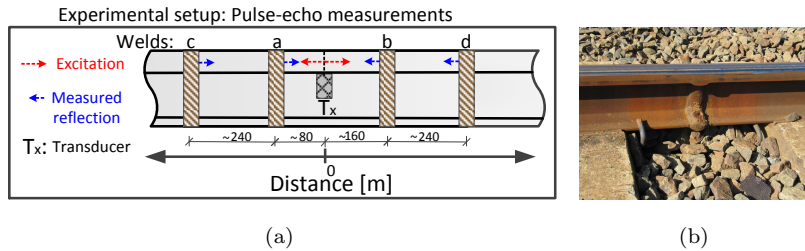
(a) Illustration of the experimental setup with estimated weld distances from the transducer location. (b) Photograph of an aluminothermic weld.
